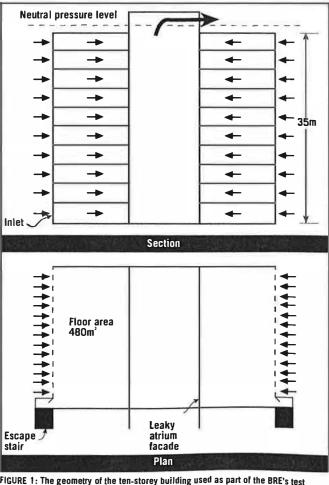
The geometry of the ten-storey building used as part of the BRE's test procedure. Each storey is 3.5 m high, with a plan area of 480 m².
